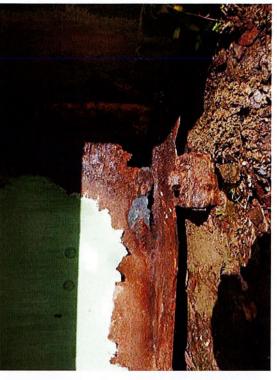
Section loss, crushing and distortion at the beam end (Typical)
